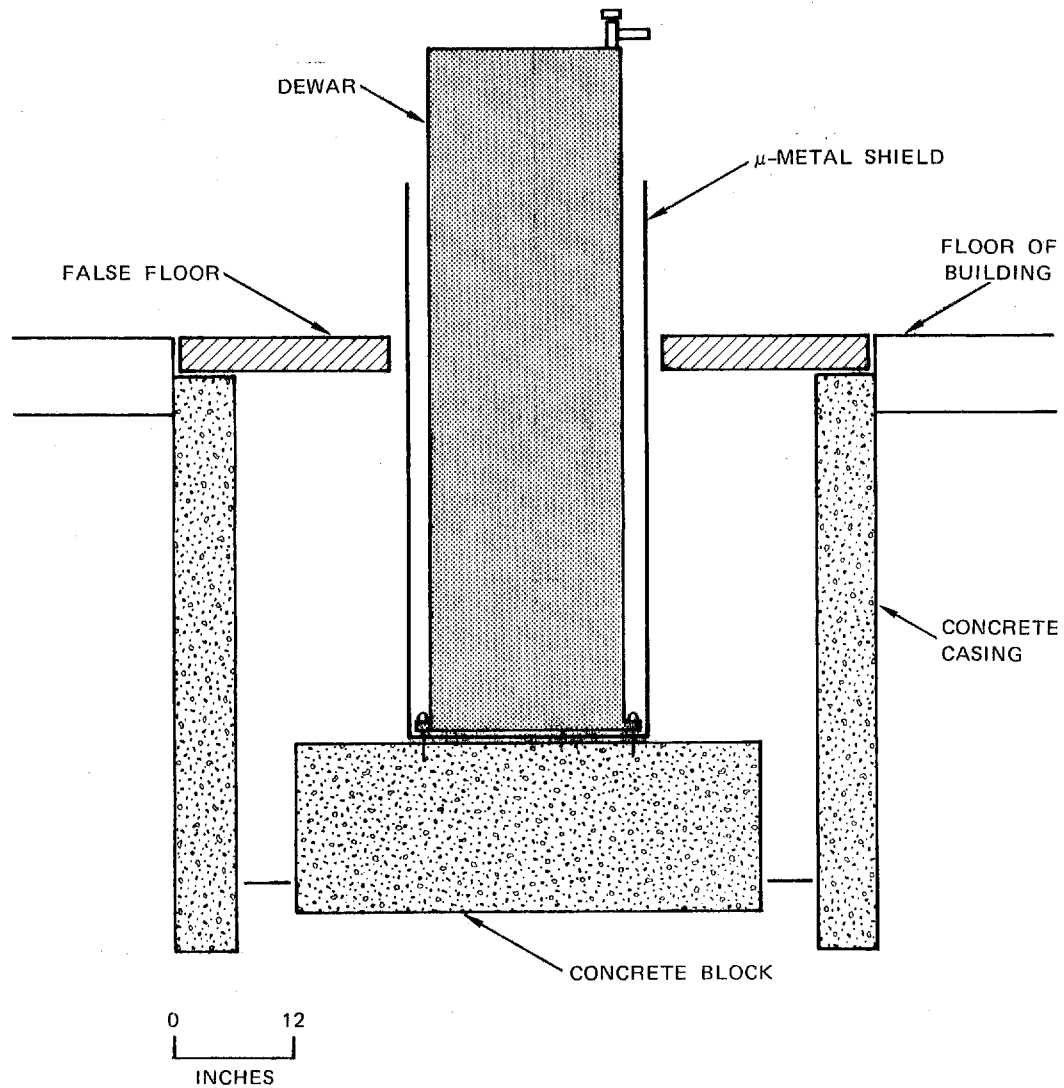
MAGNETOMETER HOUSING CONSTRUCTION
